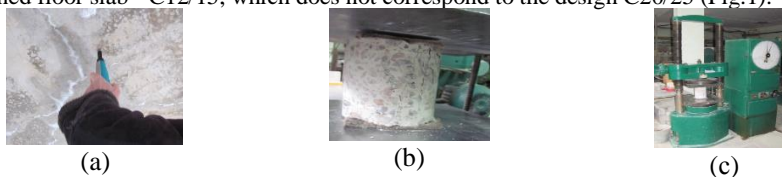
Determination of the compressive strength of concrete of a monolithic reinforced concrete slab: (a) by a non-destructive method; (b) destructive method; (c) stage of initial load of the sample.
